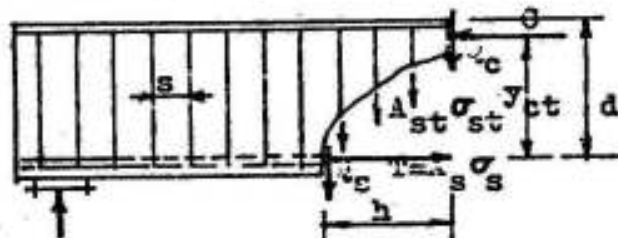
Forces at diagonal crack in beam with vert. stir.
